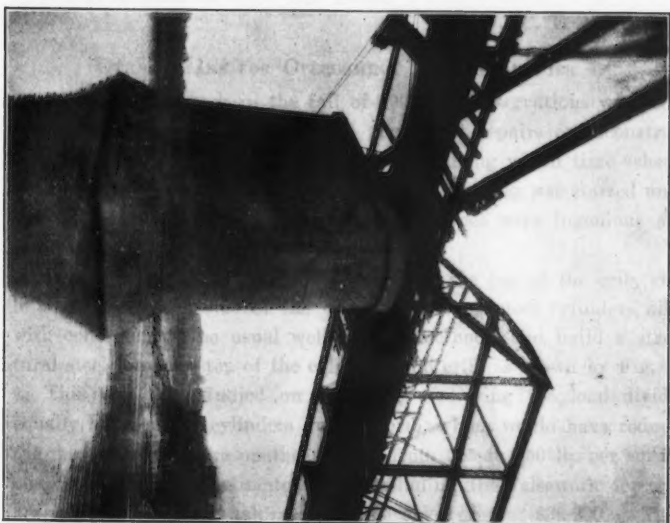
PIER 3 AFTER WORK WAS COMPLETED.
